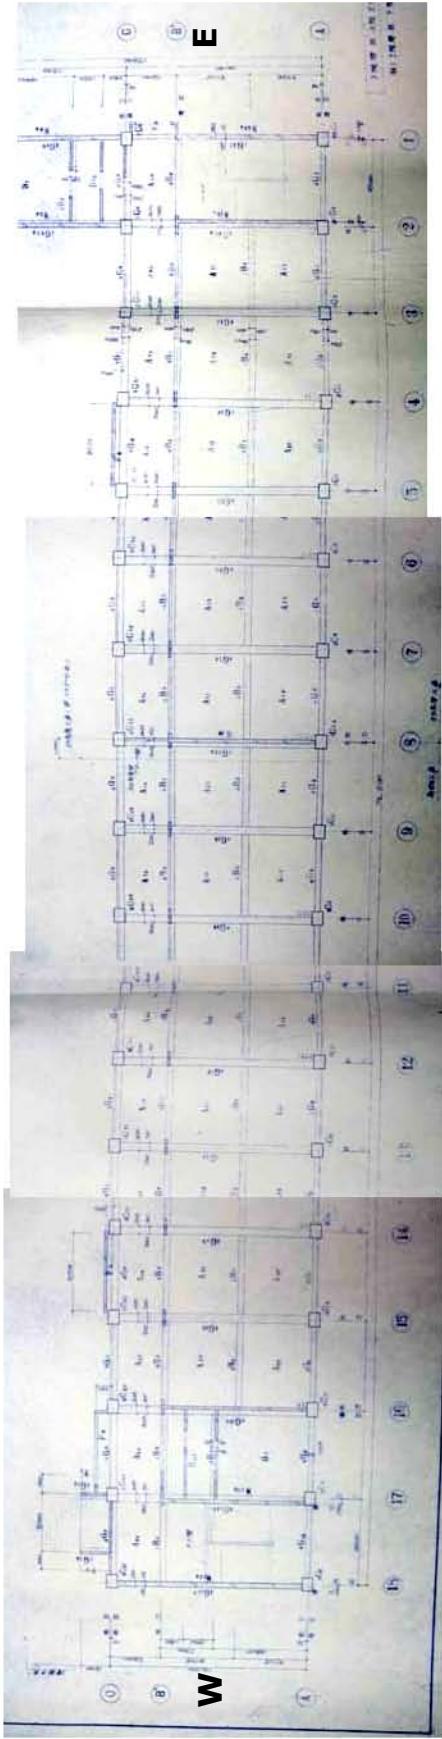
Kashiwazaki High School design drawings for typical floor plan.
